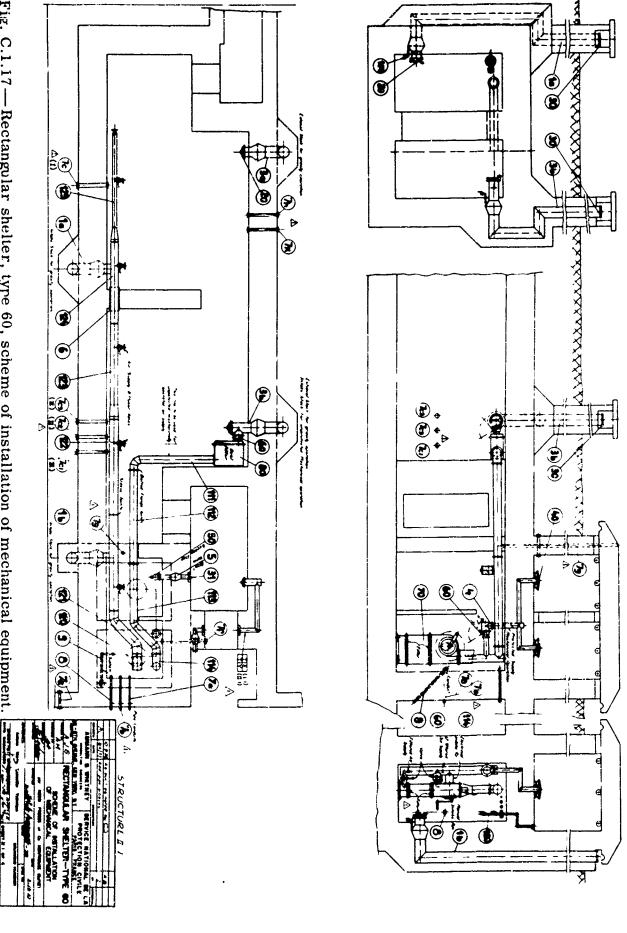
Rectangular shelter, type 60, scheme of installation of mechanical equipment.
